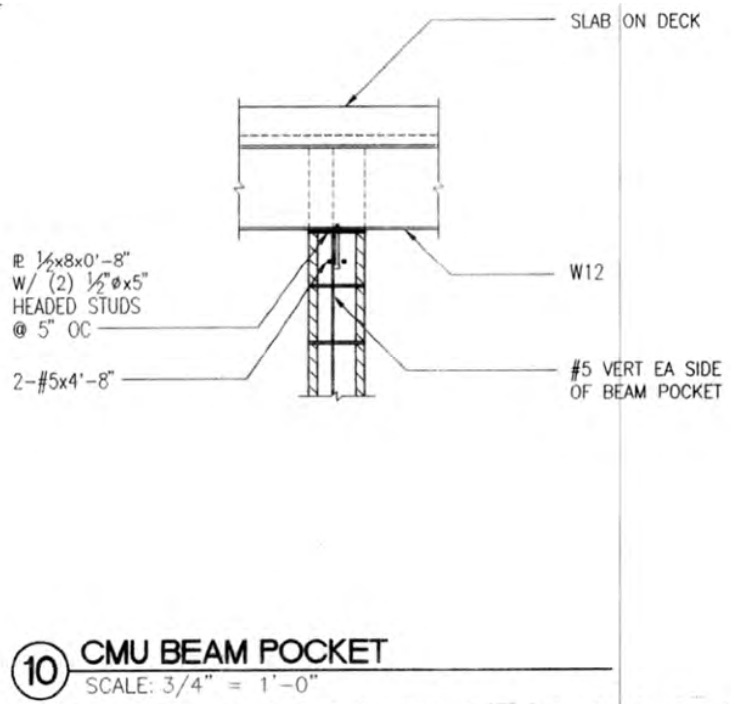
Detail 10 on S3.2 of the 1999 Addition drawings.
